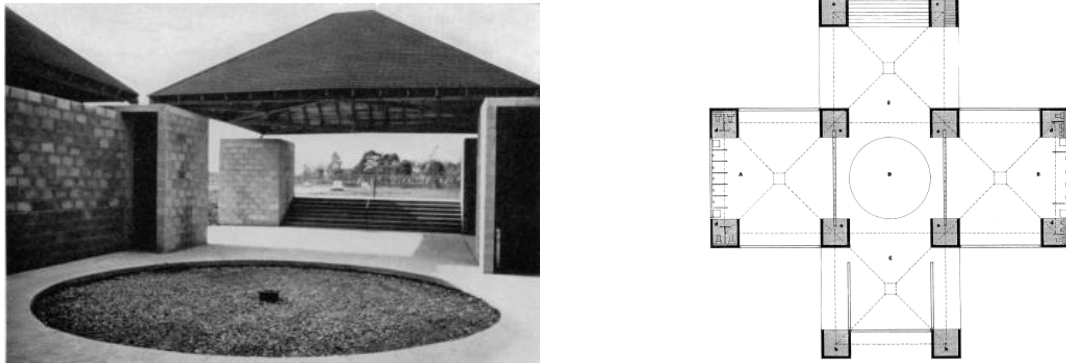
Trenton bath house plan and view from the courtyard
